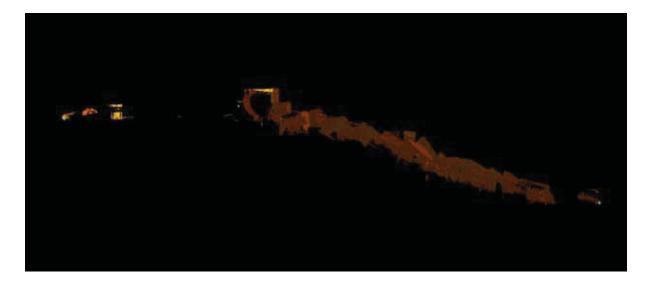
Elevation taken with Leica Cyclone data looking North through Churchill Barrier 2 and the wave wall.
